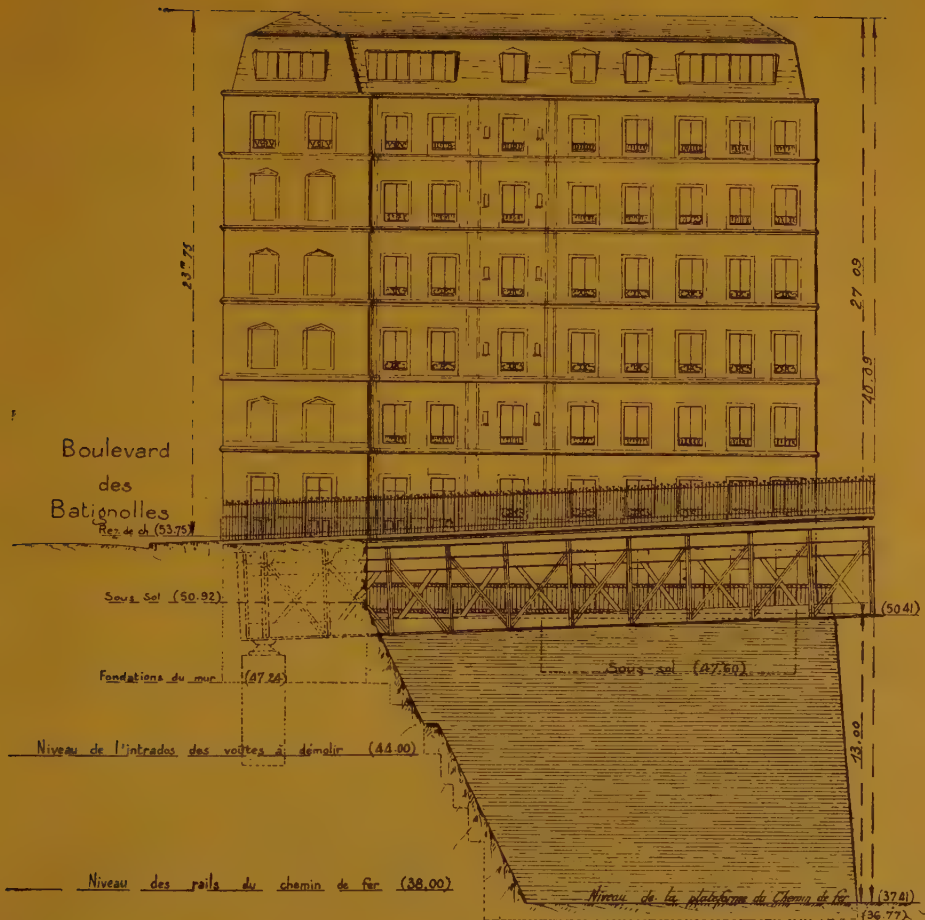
No. 43 Boulevard des Batignolles. — General view of the building from the railway.
